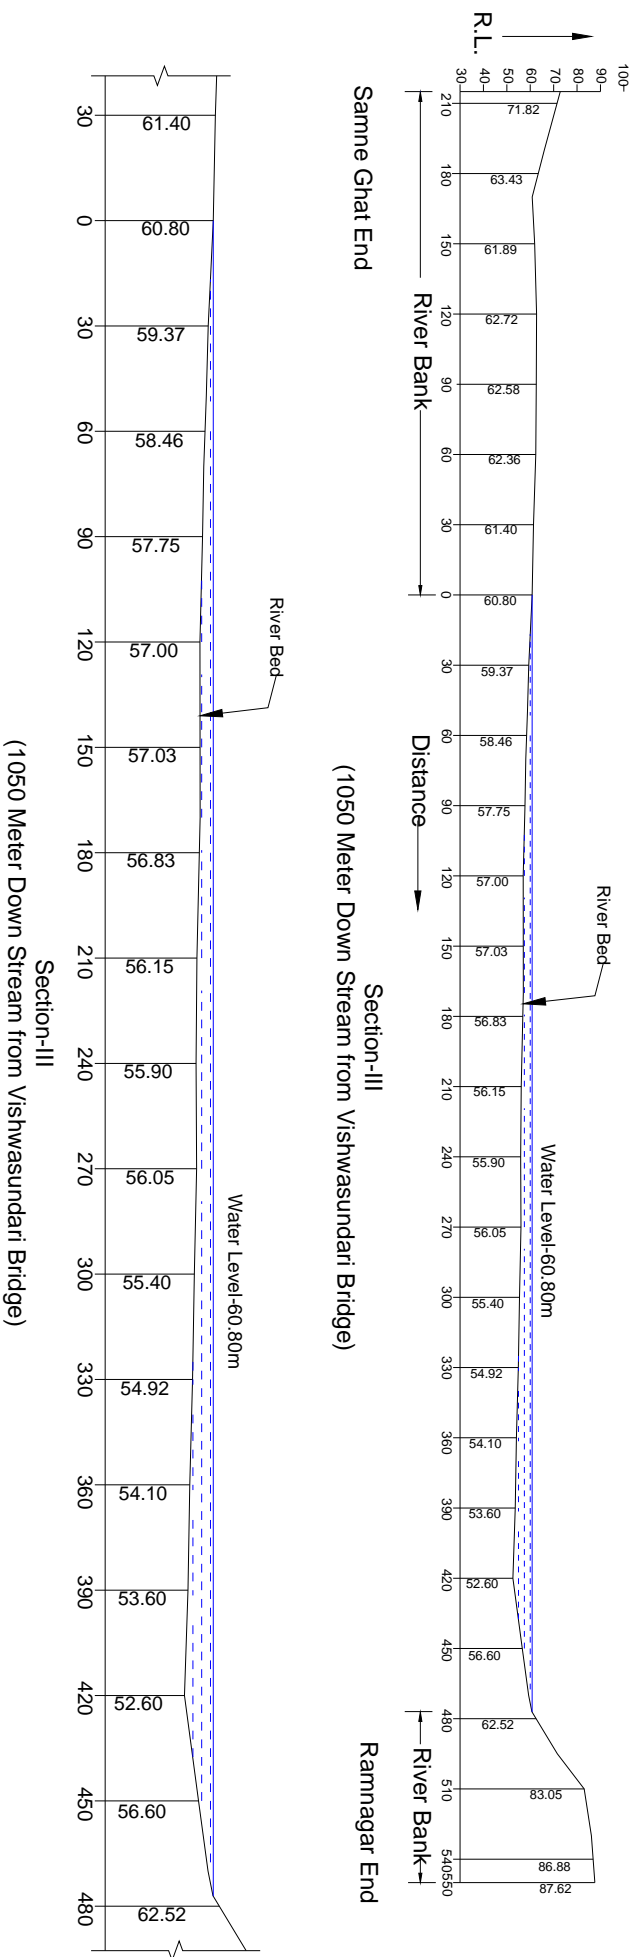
(c): Cross section of River Gandak 1050 m Downstream of Vishwasundari Bridge
